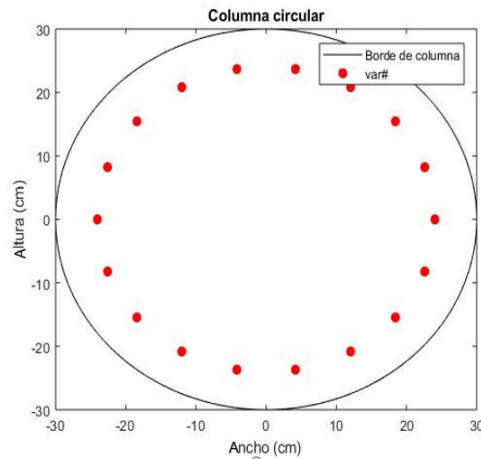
Drawing of the designed reinforced concrete column cross section.
